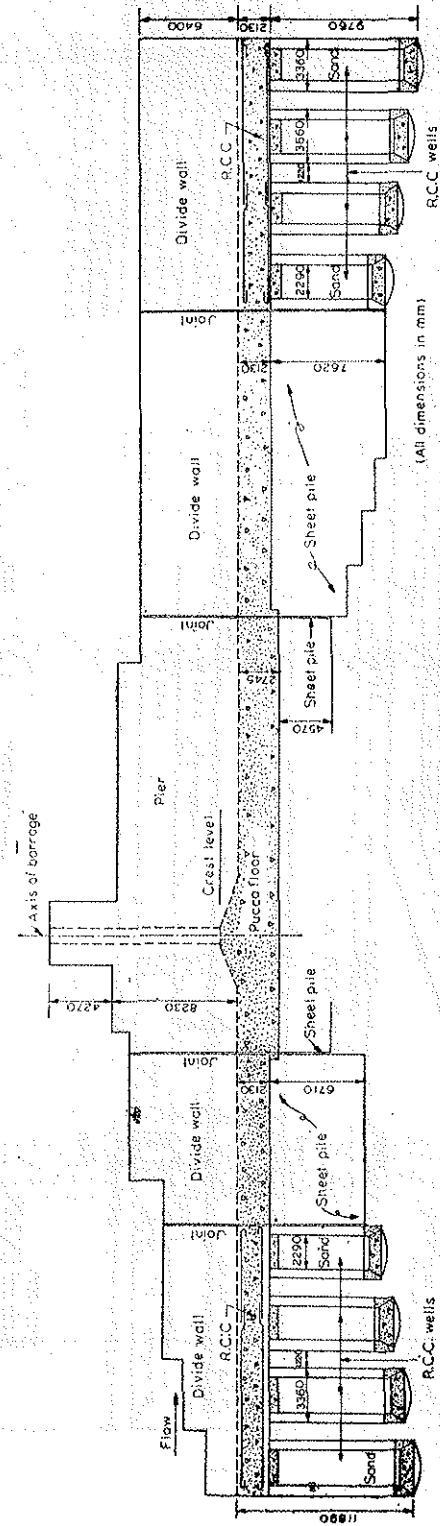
Details of divide walls of Wazirabad Barrage.
